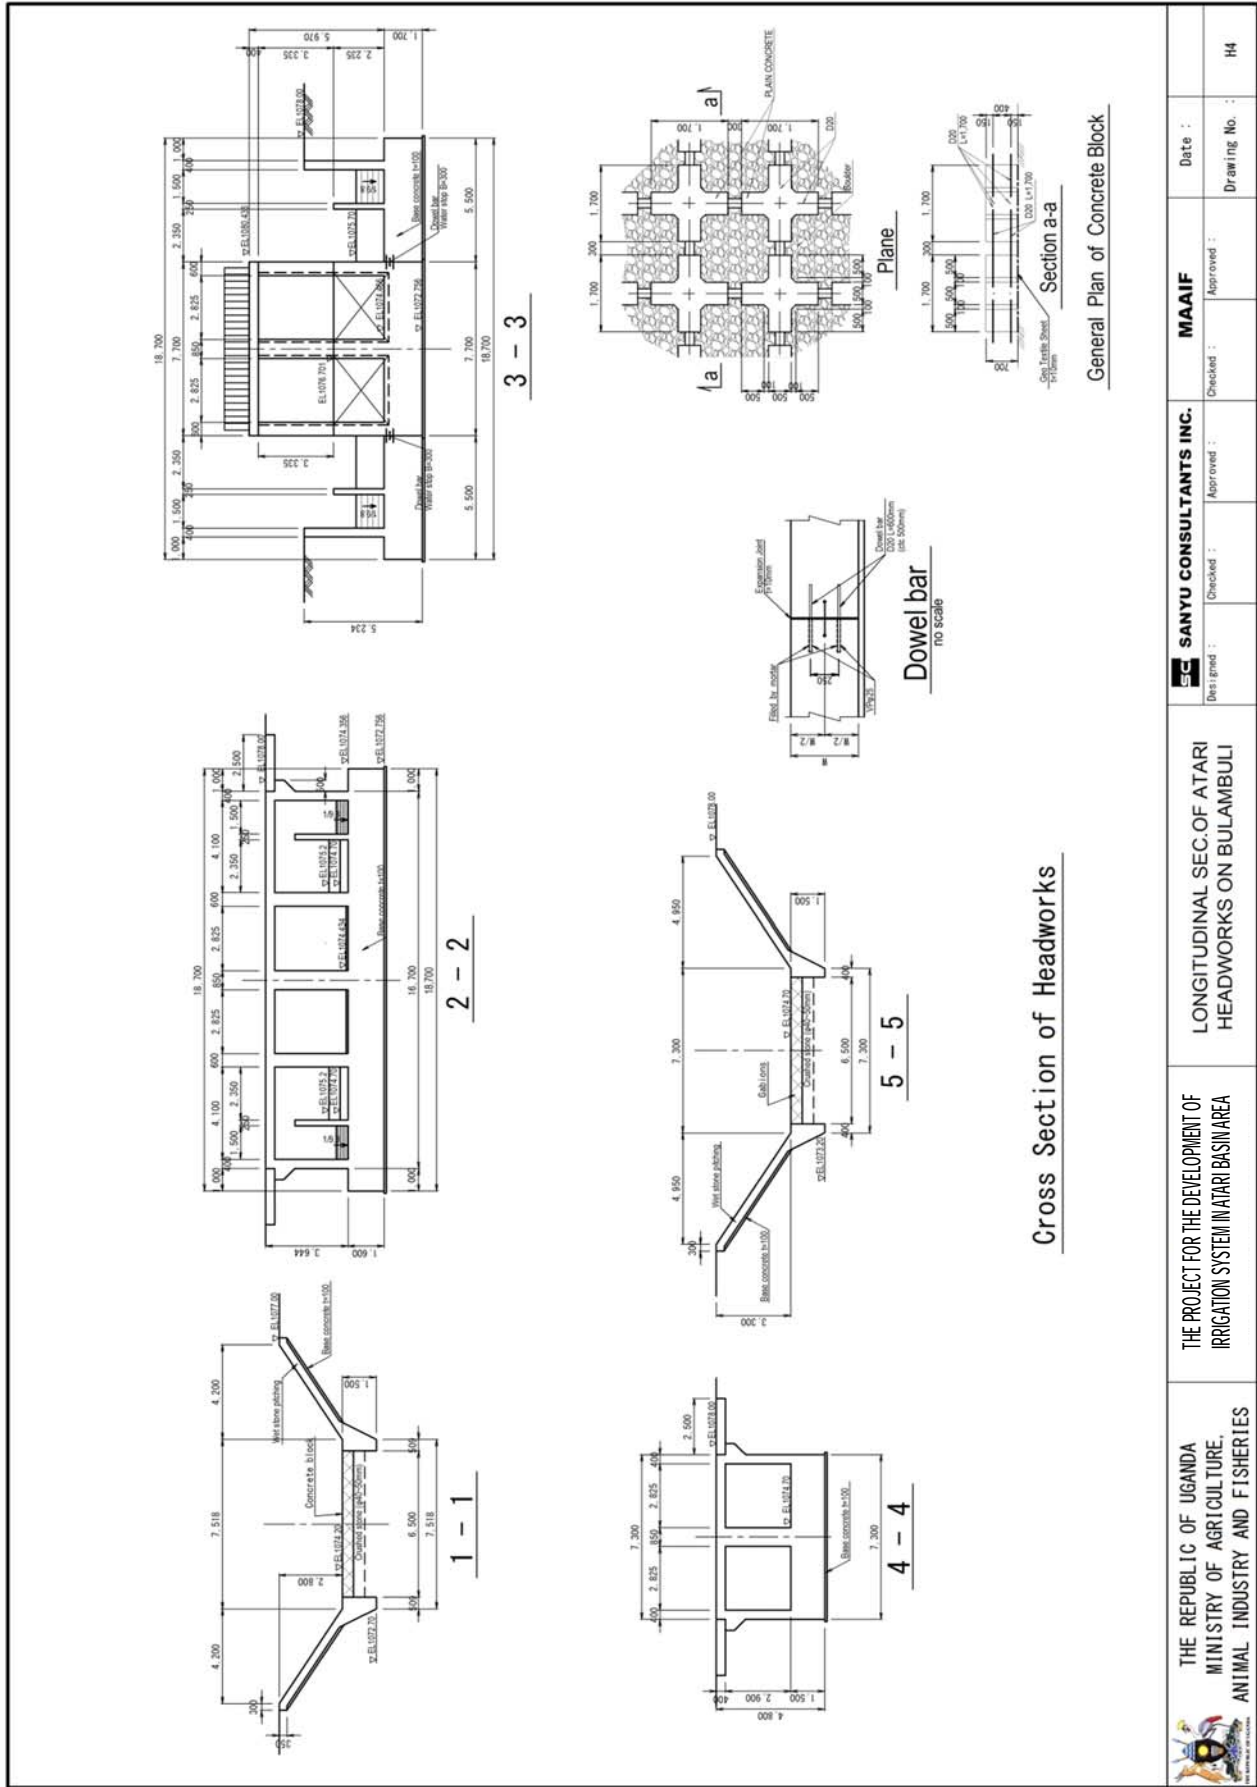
General Plan of Headworks (3/3)
